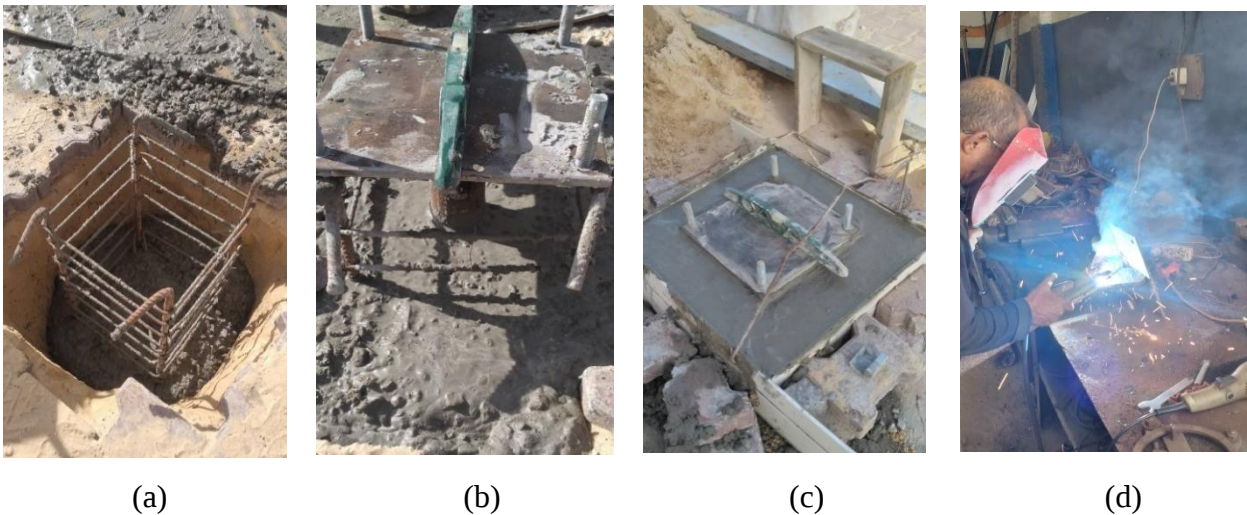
(a, b, c, d). The various stages of building a concrete foundation
